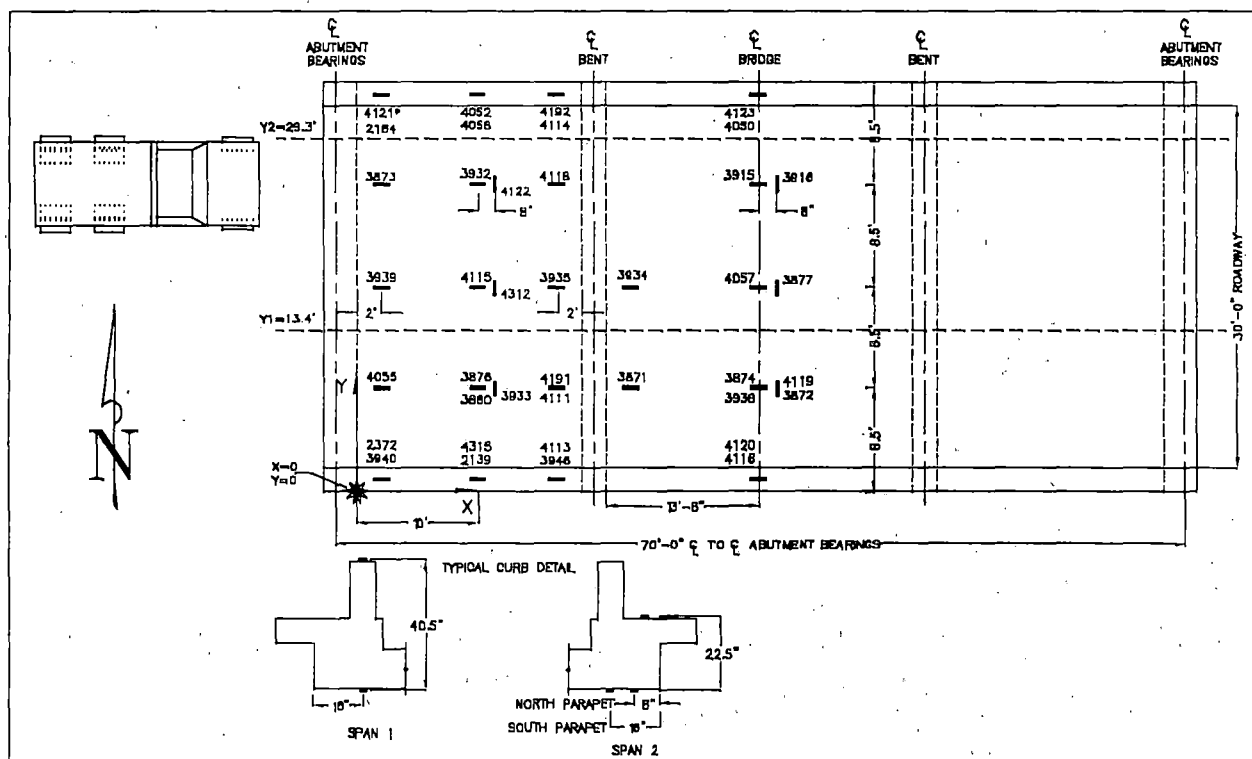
US-20 over West Cedar Creek - Instrumentation Plan.
